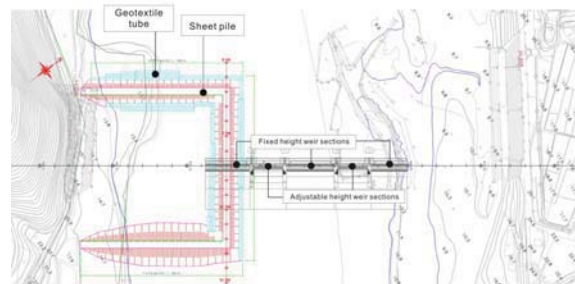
Cofferdam for construction of southwestern portion of proposed Dalsung Weir
